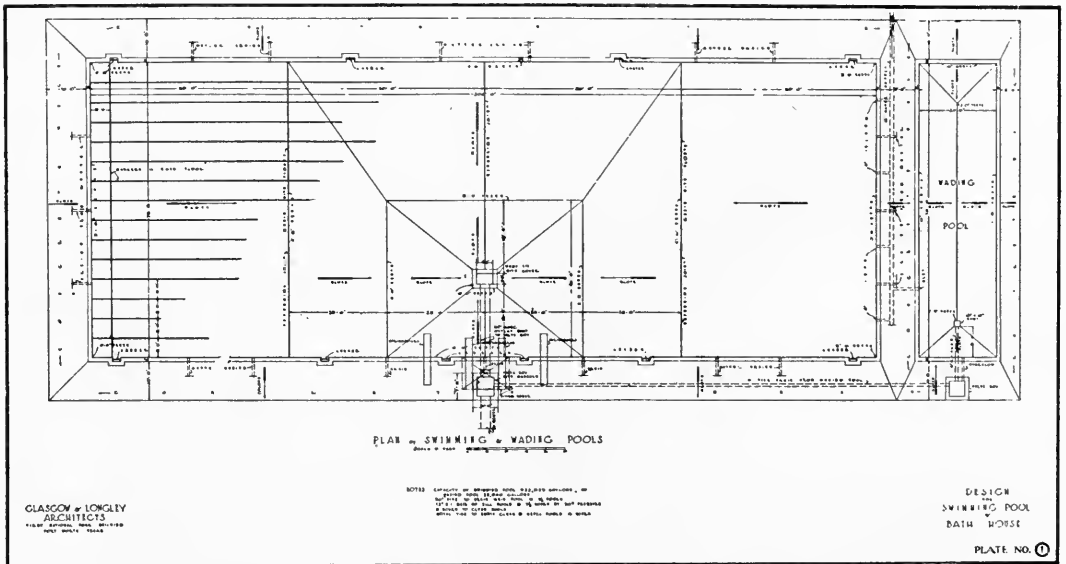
PLAN OF SWIMMING AND WADING POOLS
